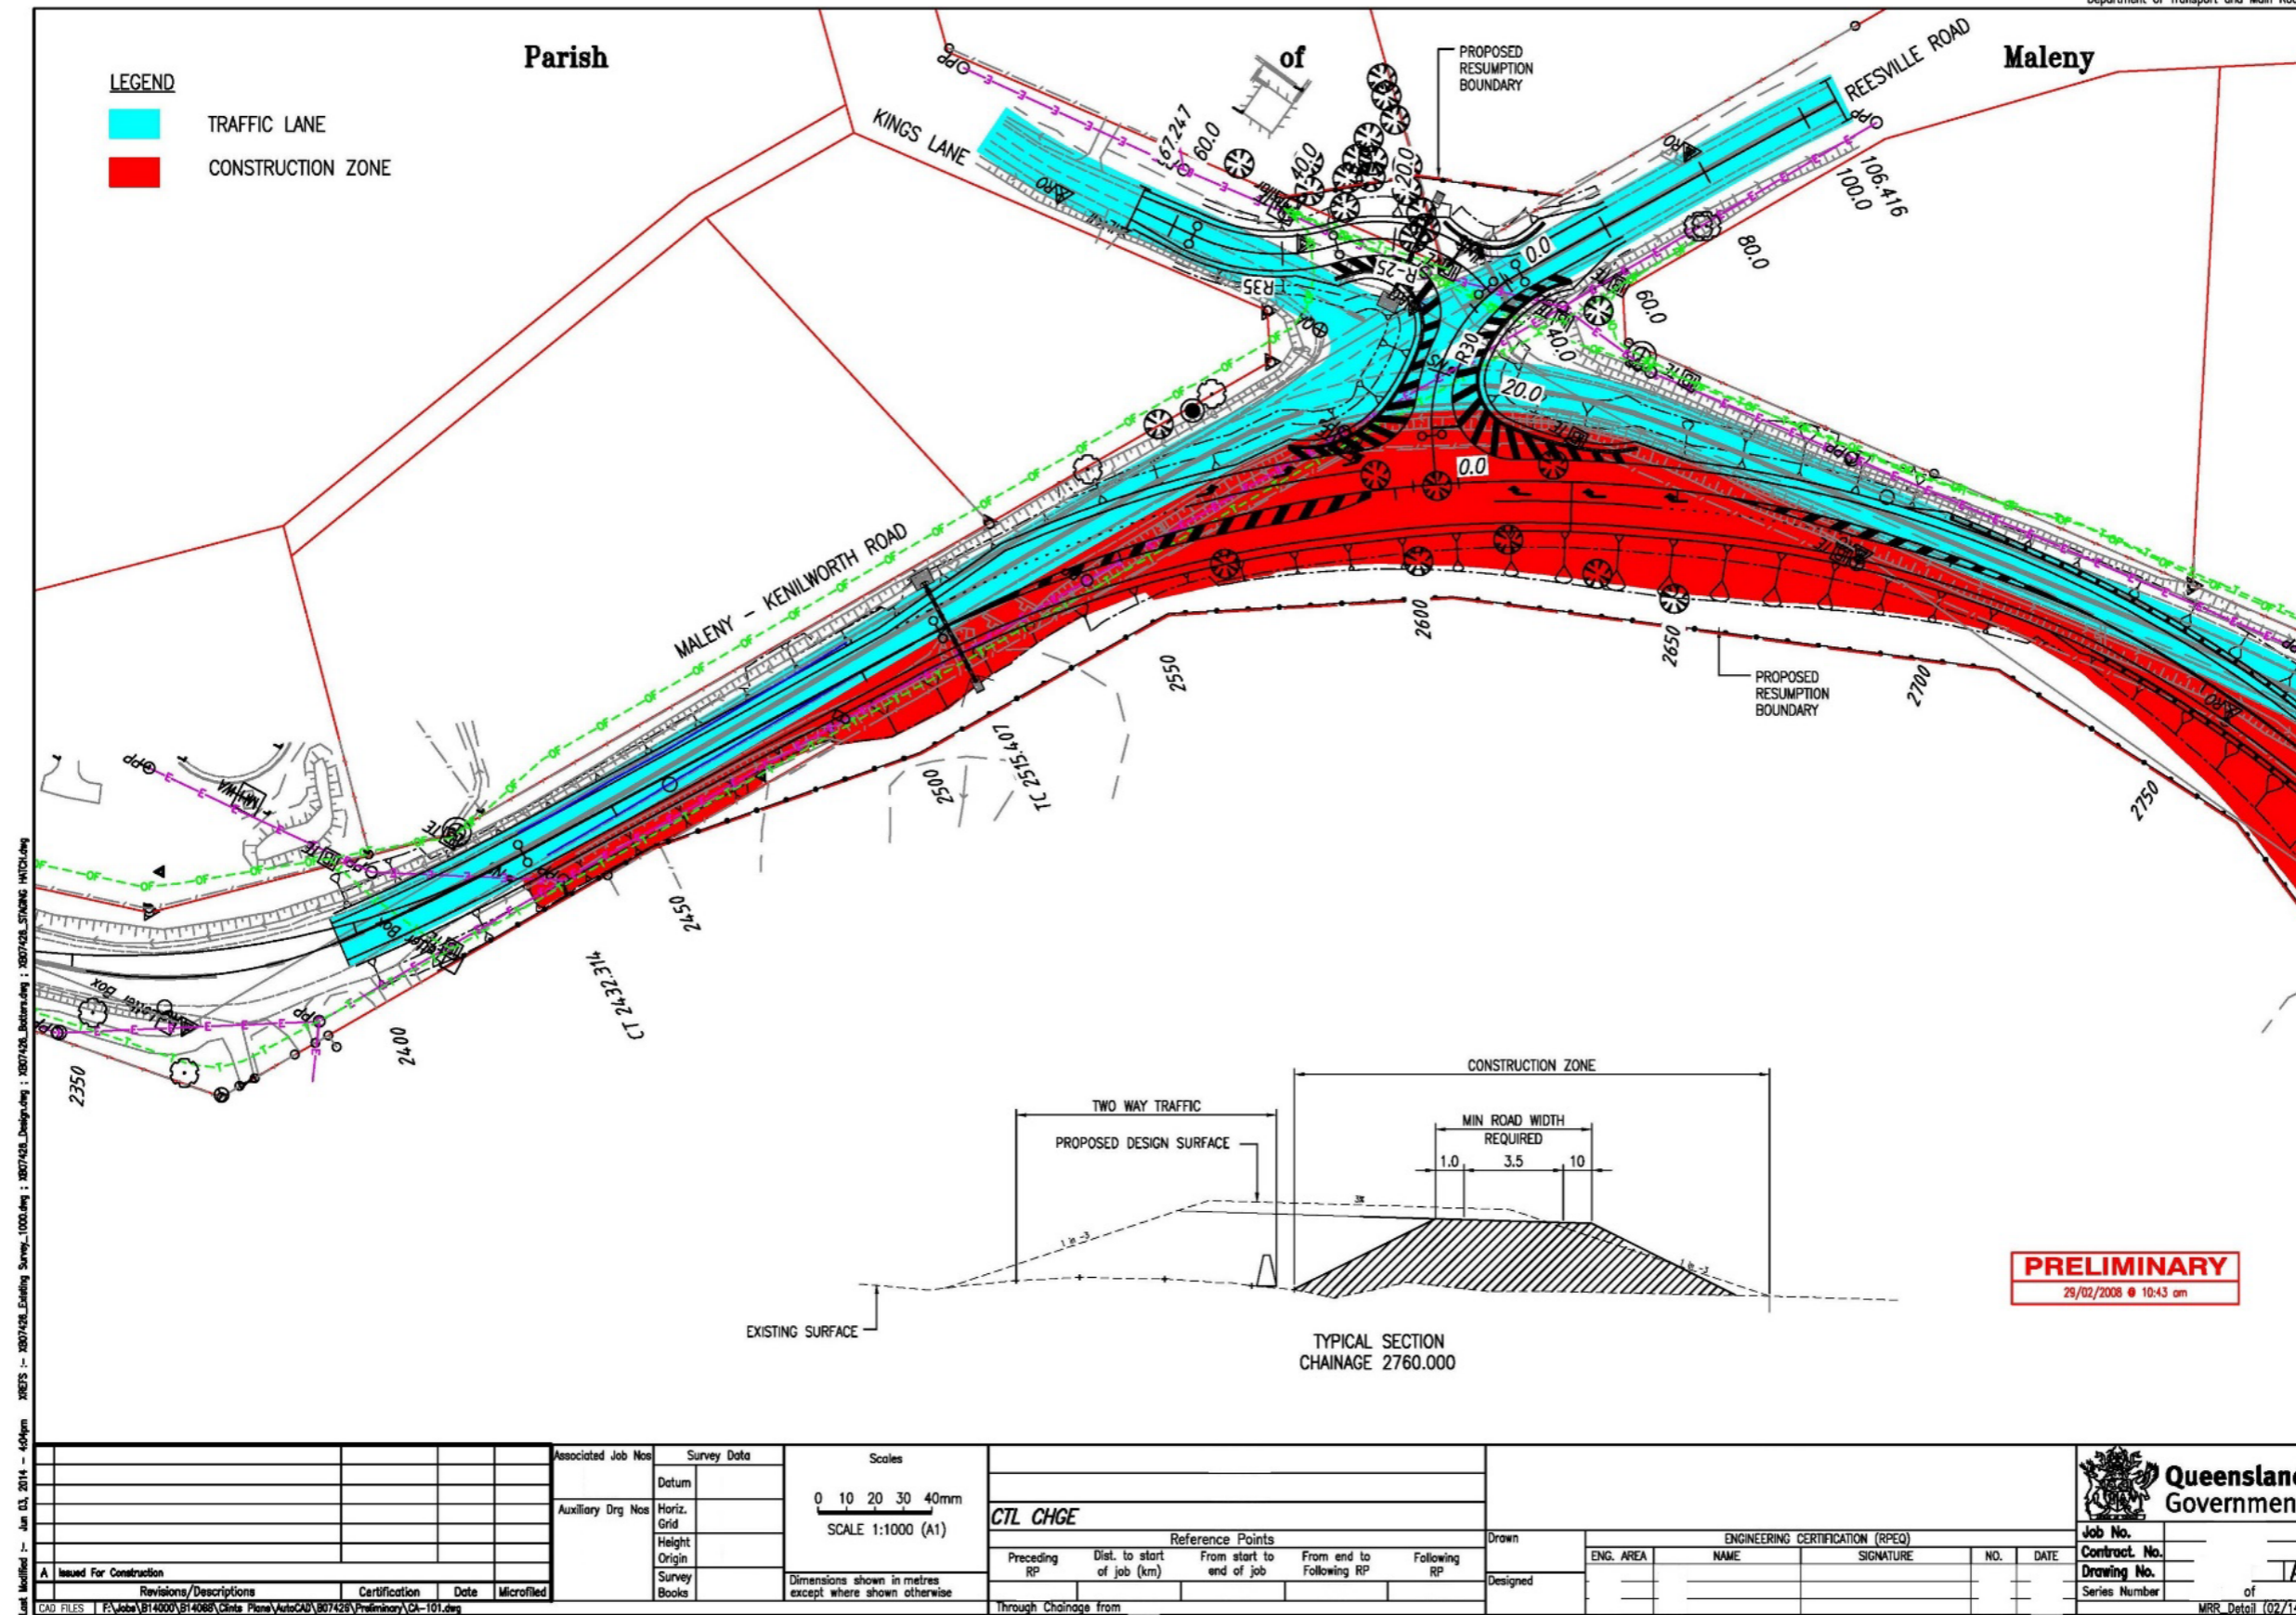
(b) – Construction staging – generic example 1 – sheet 2 of 2
